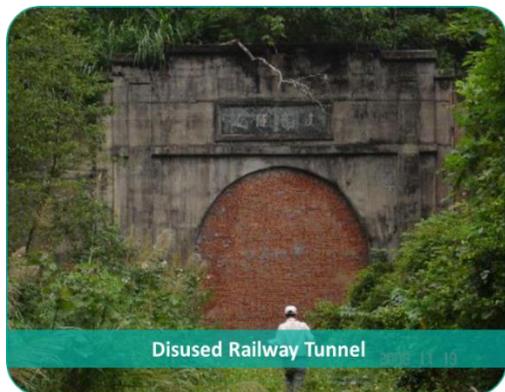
Utilization of Abandoned Railway Tunnel for Mucking by Rail Haulage
